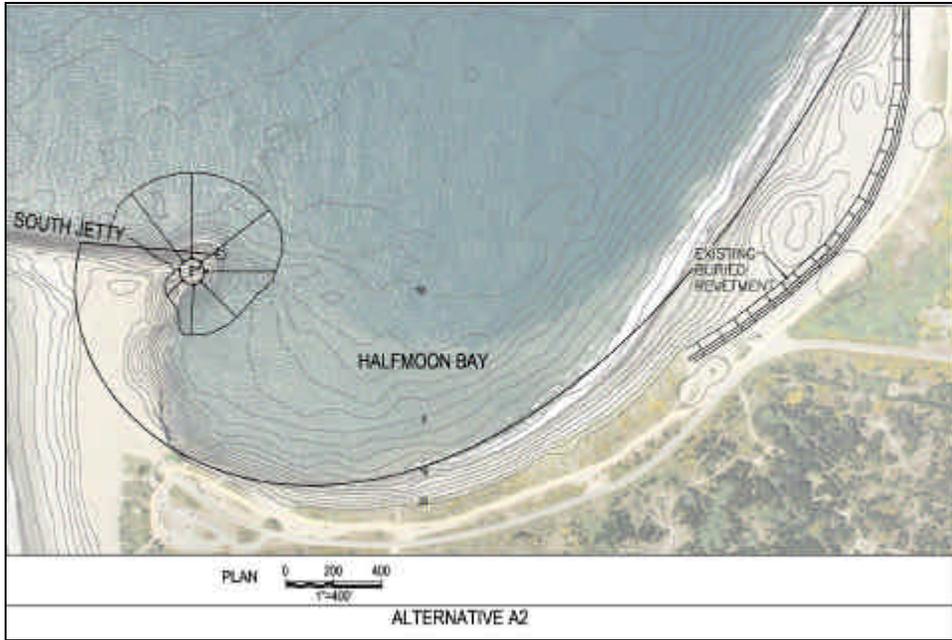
Equilibrium planshape for a control point consistent with Alt A2
